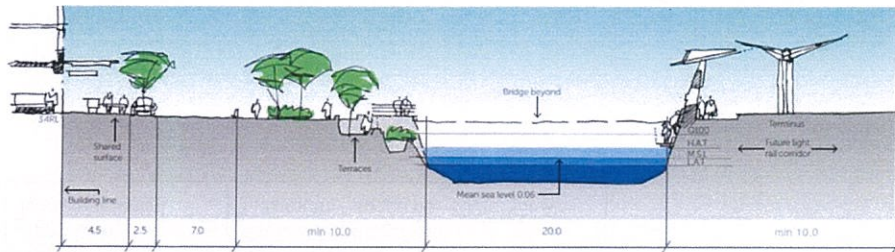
Corso Esplanade (West of Main Street Boulevard) (Looking West)
